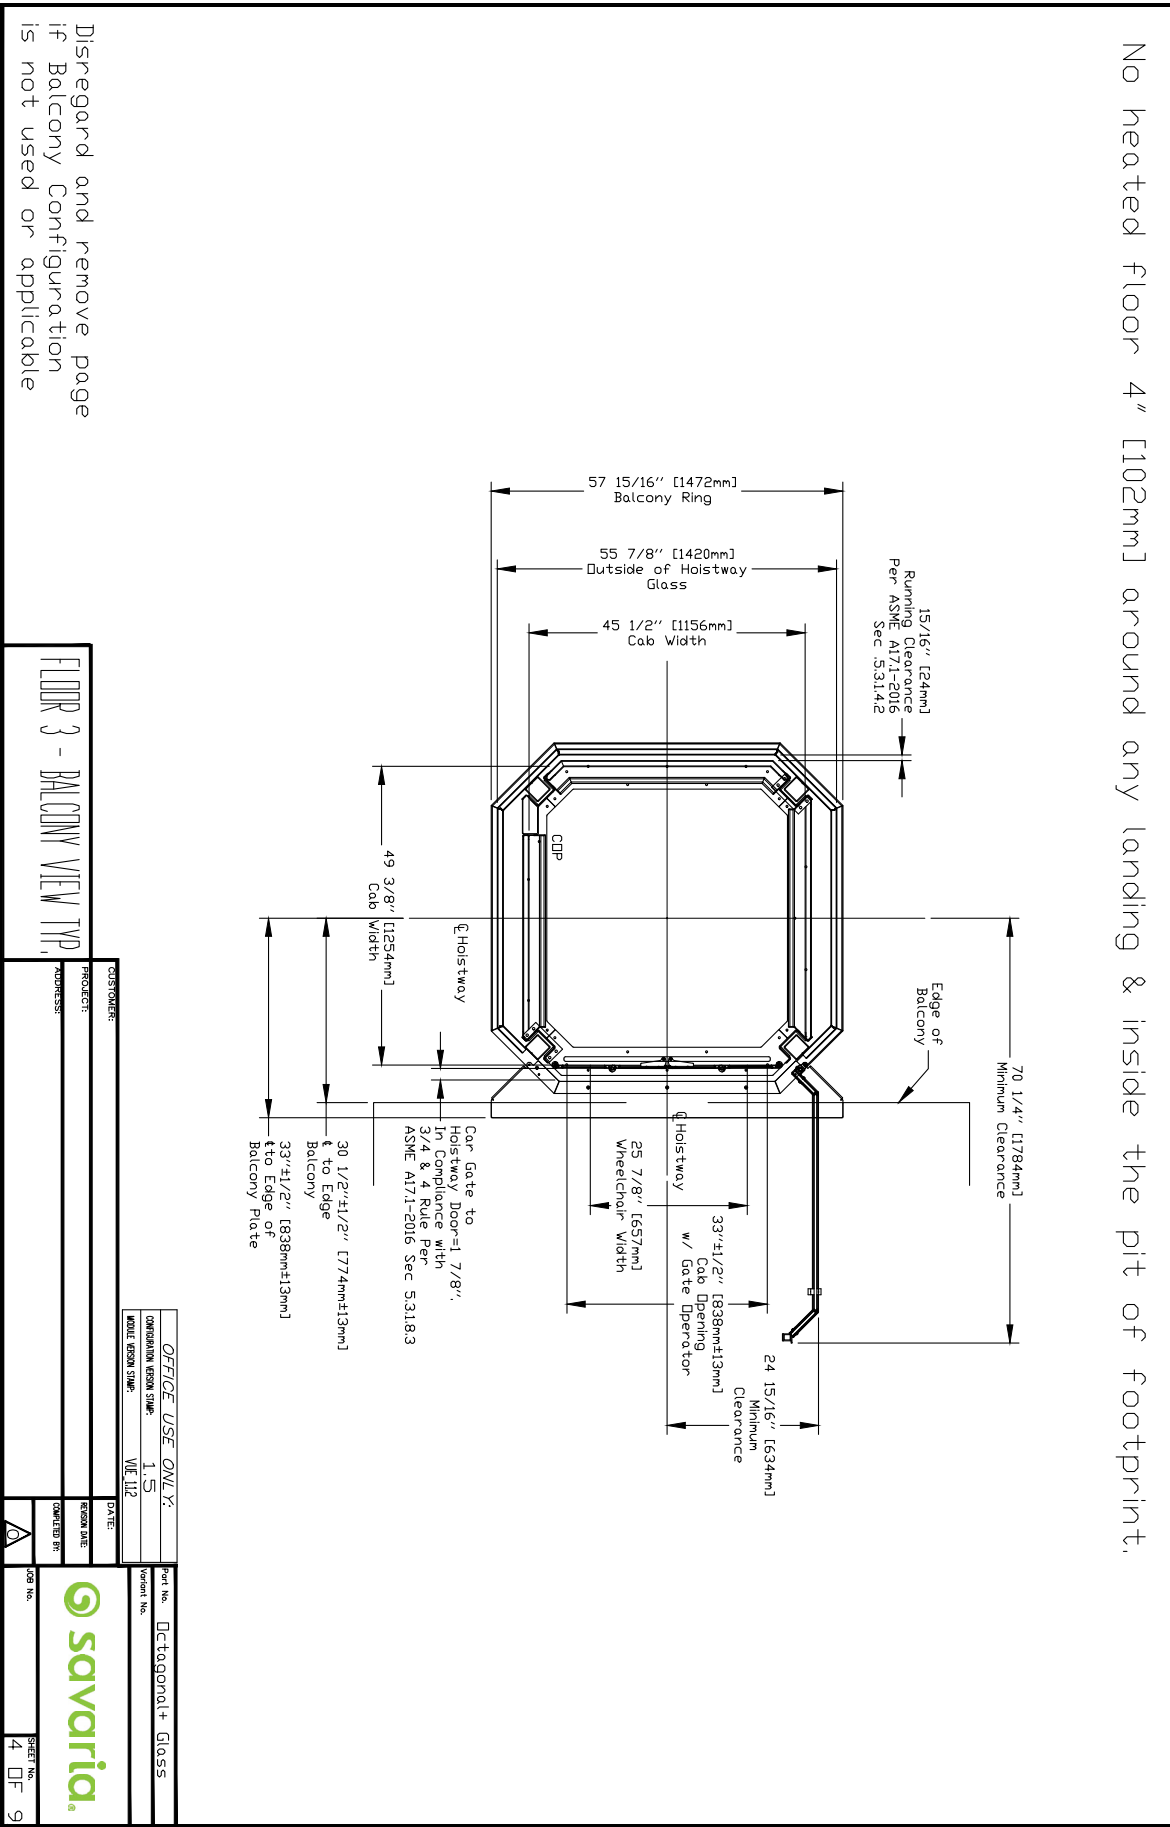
Balcony plate and handrail information - octagonal+ glass (OGL) type 1 shown
